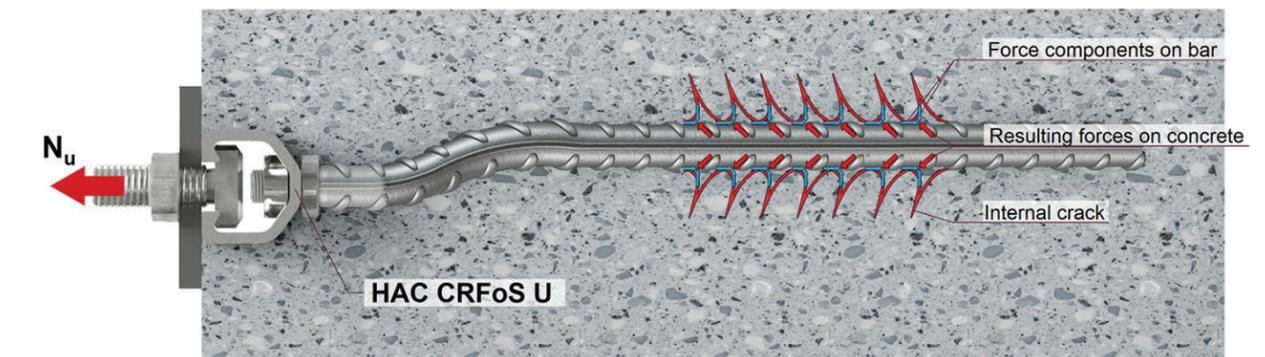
Cast-in anchor channel with reinforcing bar anchors (HAC CRFoS U) loaded in tension.
